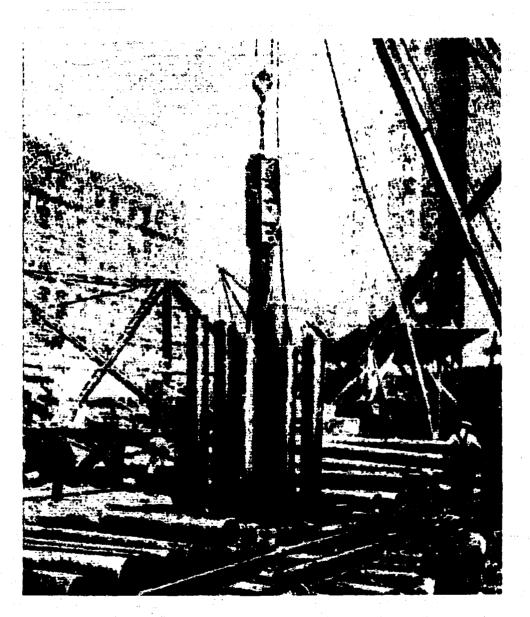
Driving Steel Piles with an American Steam Hammer
